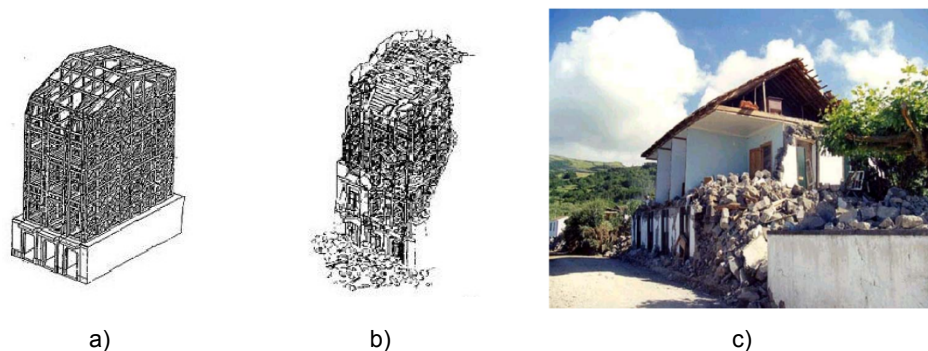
'Pombalino' structural design and possible collapse mechanism (Mascarenhas, 1996): a) Tri-dimensional timber structure; b) After a seismic scenario the masonry walls would fall without putting at risk the interior timber structure; and c) Building whose exterior walls have fallen out-of-plane in the 1998 Azores earthquake without complete collapse (Cardoso, 2002).
